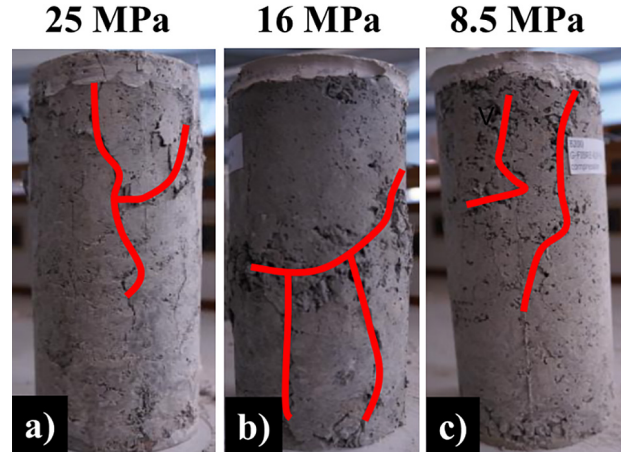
Failure modes of the glass fibre reinforced concrete (GFRC).
